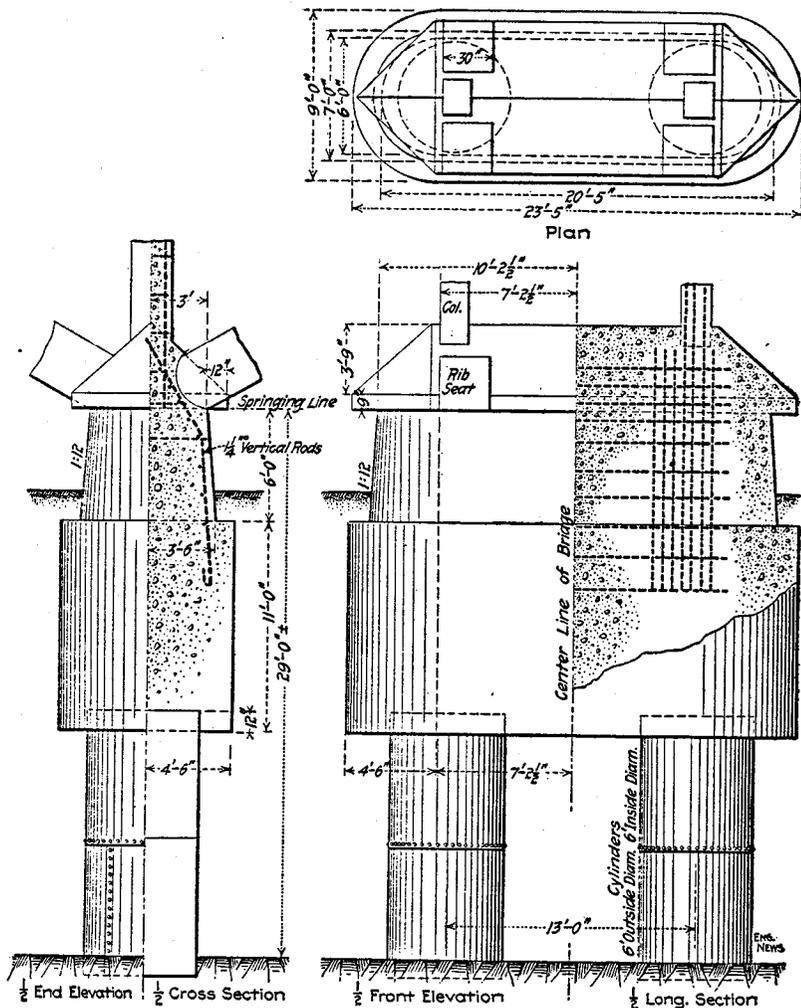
DETAILS OF PIER 1, TYPICAL OF CAISSON-FOUNDED PIERS
